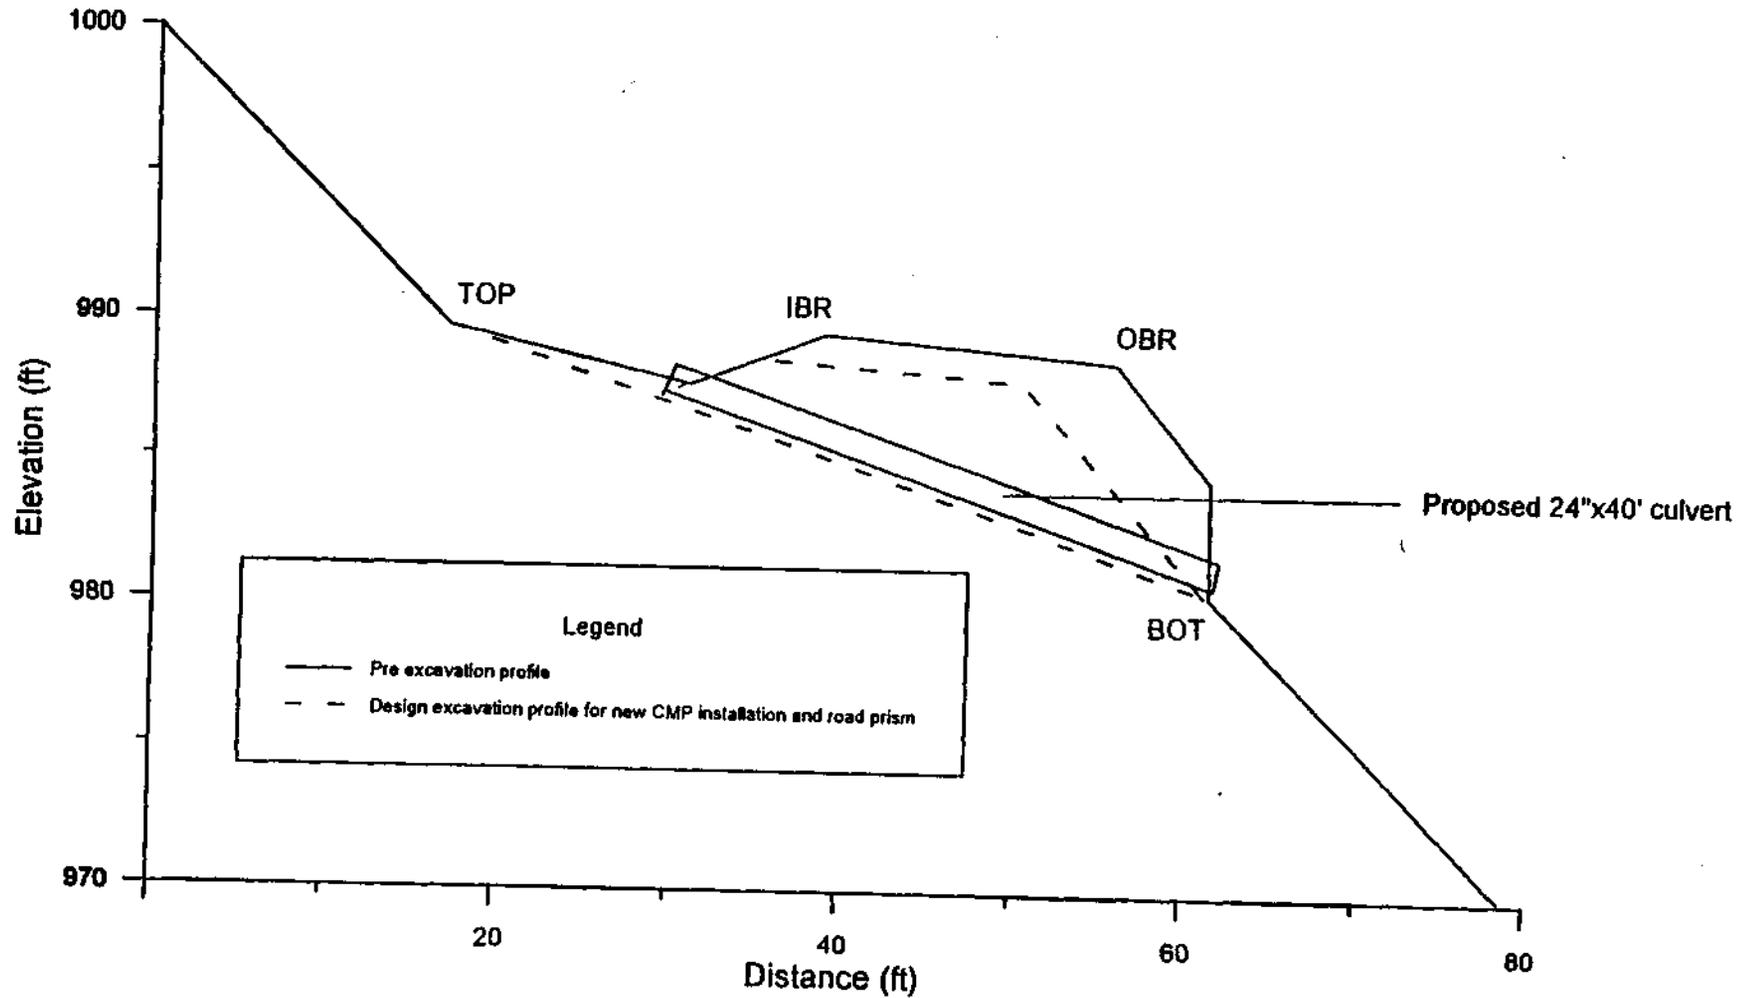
Ashton Road: Site 1A Stream Crossing Pre & Design Excavation Profiles.
